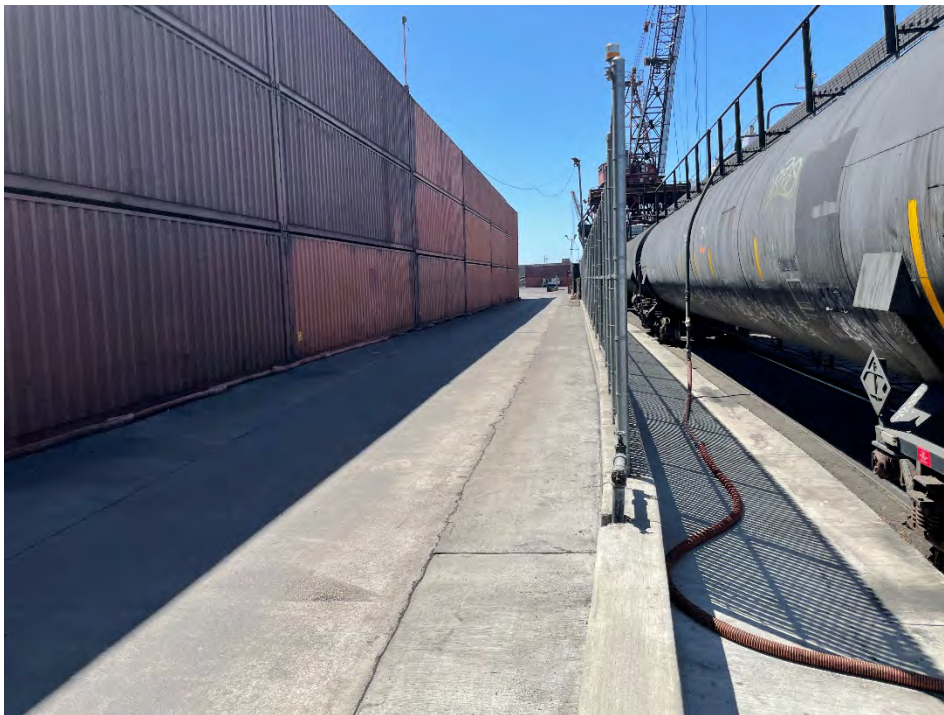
Looking south from SW-4 toward SW-3, adjacent to Lauritzen Channel. Concrete seams appear in good condition.
